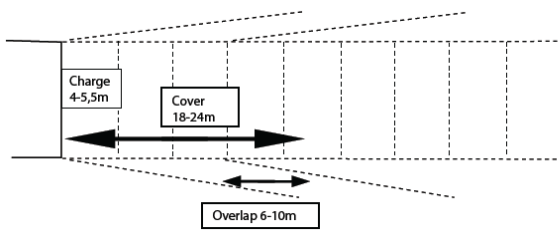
Typical layout of grout curtain in D&B tunneling (NFF, 2011)
